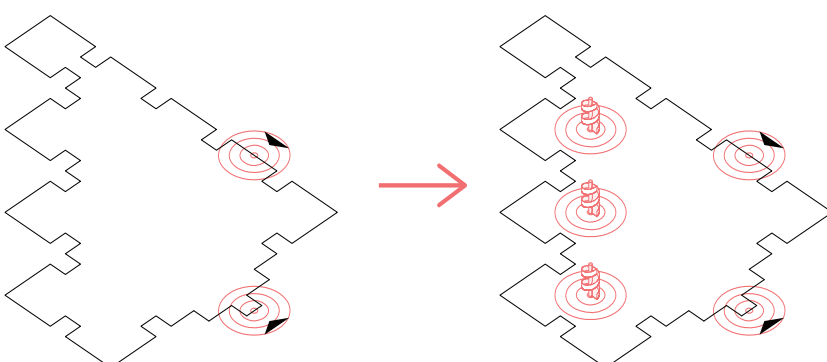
by small architectural approaches such as placing additional stairs could create new hierarchies in the building(J.Lim, 2017)
